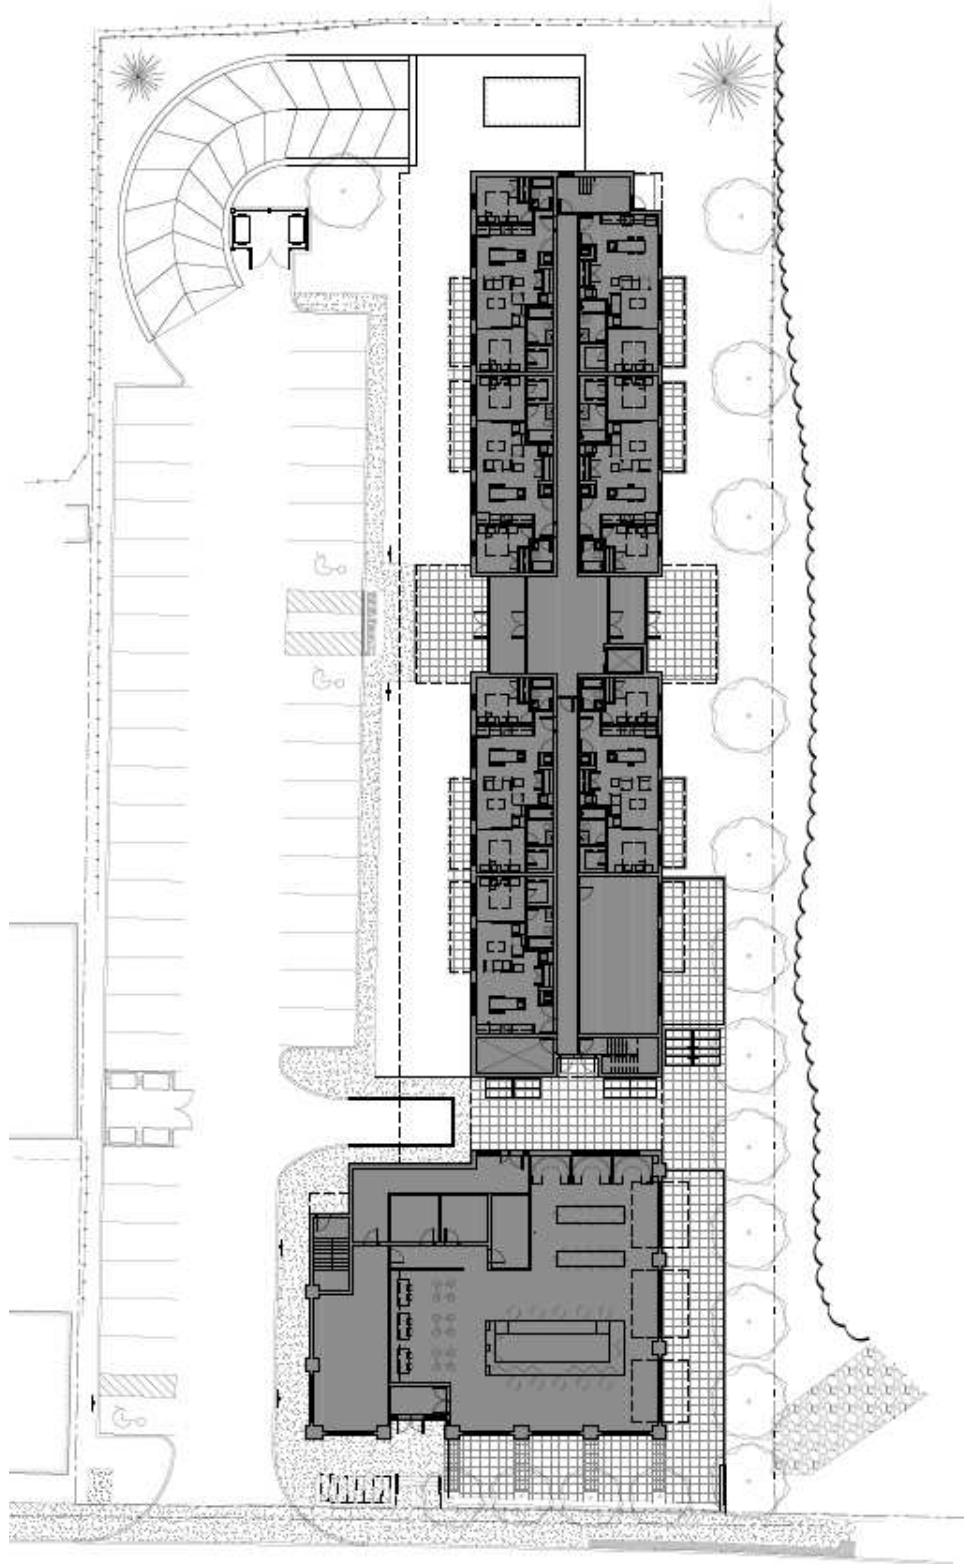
Ground floor plan. Source: Vandenberg & Wildeboer Architects, Nov. 2020.
